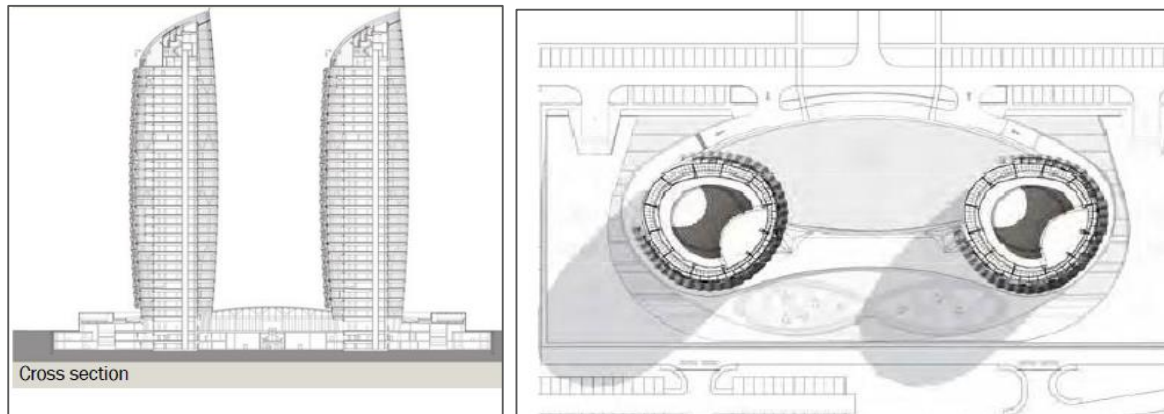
Al-Bahar Towers, Abu Dhabi, cross section and site plan (URL-2)
